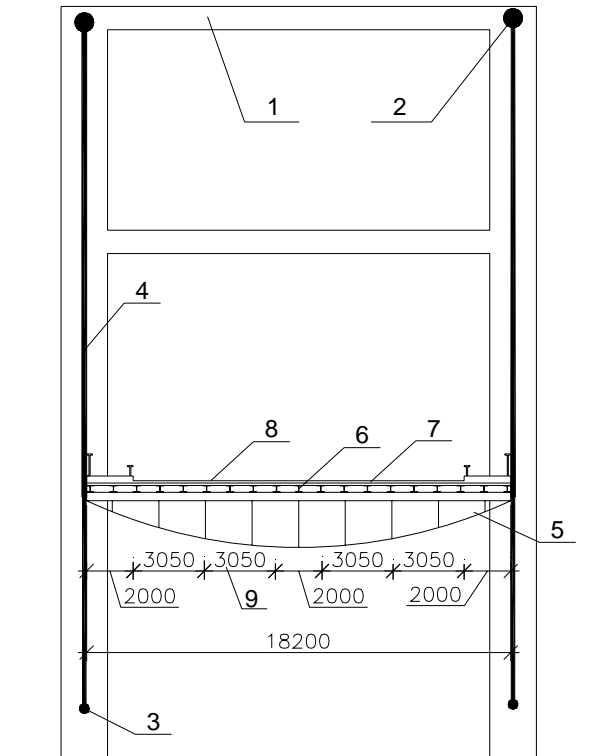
The bridge cross-section A-A. 1 – Pylon of the bridge, 2 – Main load caring cable, 3 – Stabilization cable, 4 – Suspensions, 5 – Composite trussed beam, 6 – Composite I type beams, 7 – Composite plank, 8 – Cover of the bridge, 9 – Lines of the bridge
